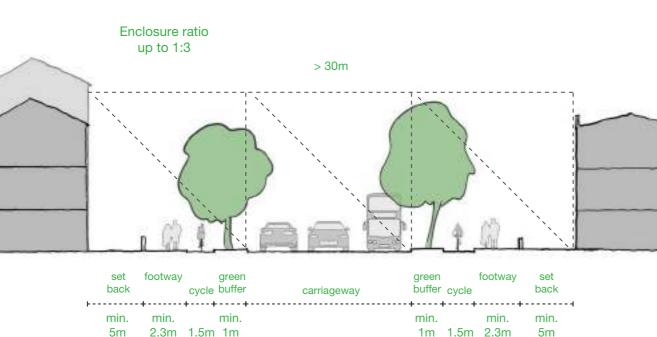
Typical street section of primary traffic street in Lichfield City Centre area
